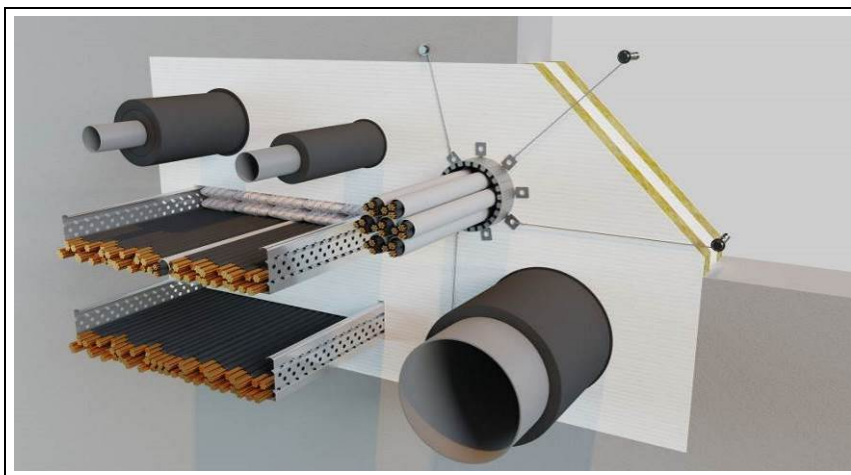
Example of AF PANEL seal in a rigid wall EI 180.
